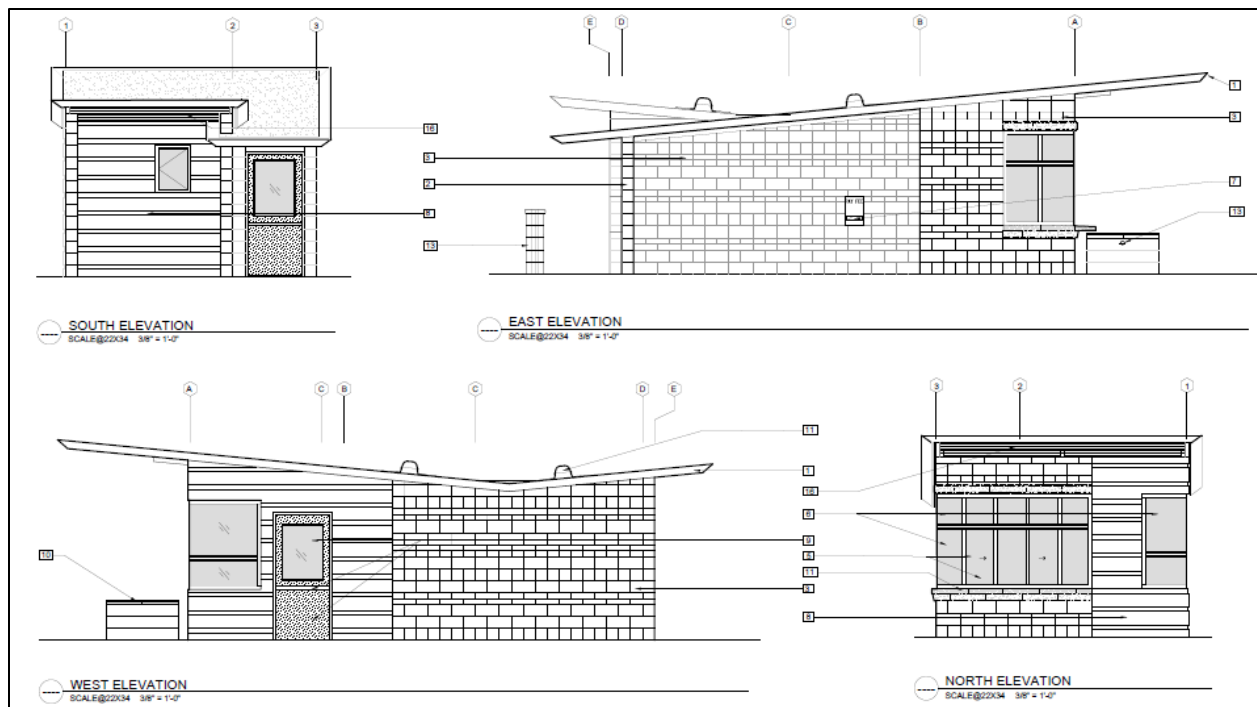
Proposed Kiosk Elevation, as shown in Appendix A5
